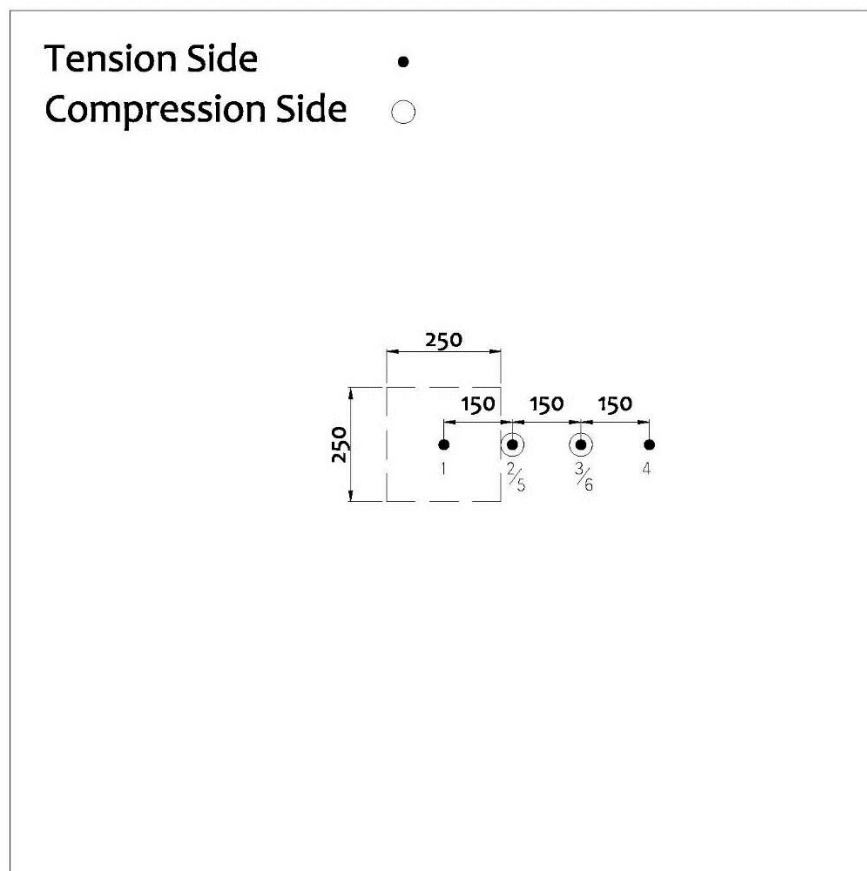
LVDTs Arrangements in a Typical Test – Plan View
